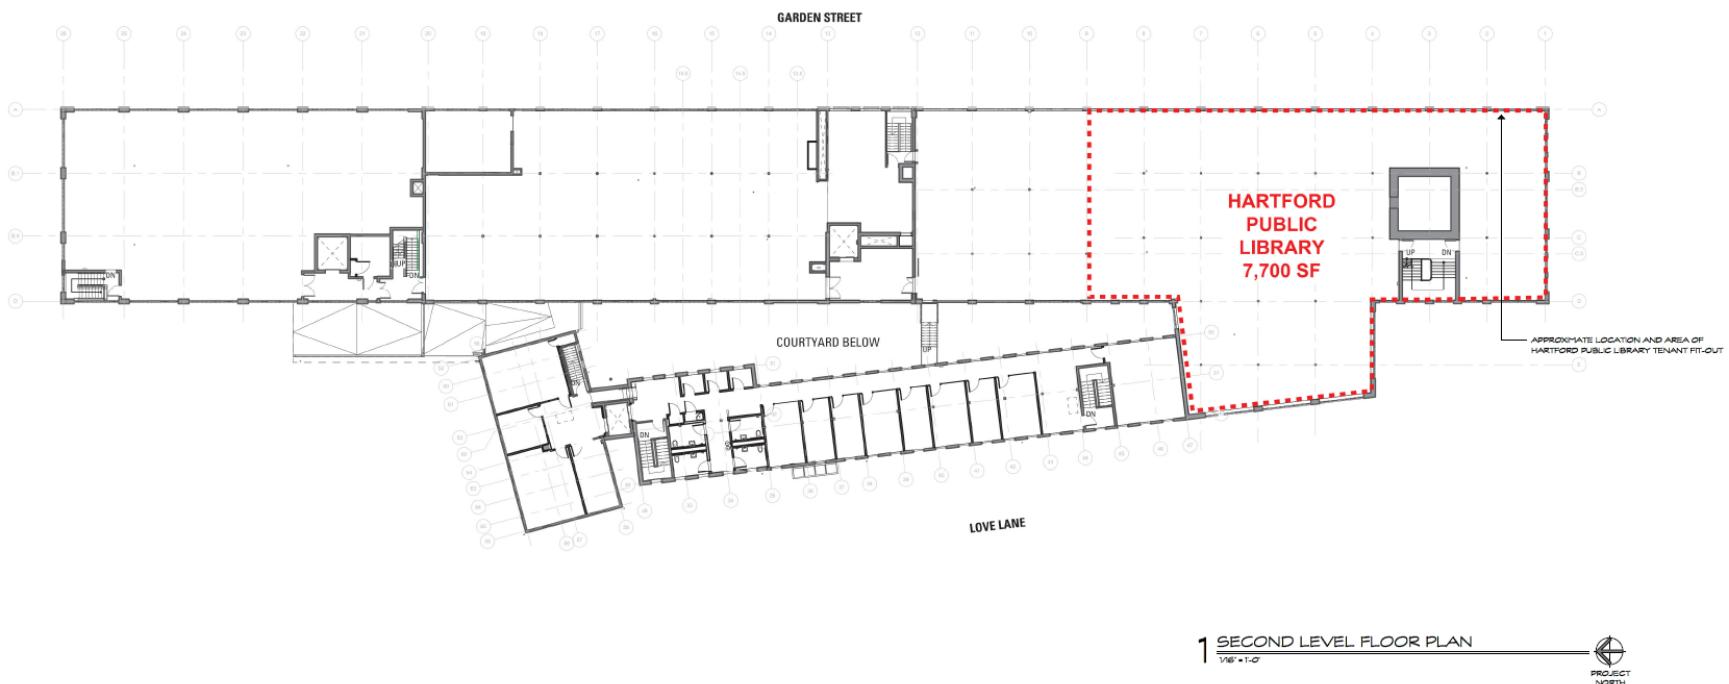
Second level floor plan showing location of the proposed library (prepared by Silver Petruccelli + Associates dated 5/9/2022).
